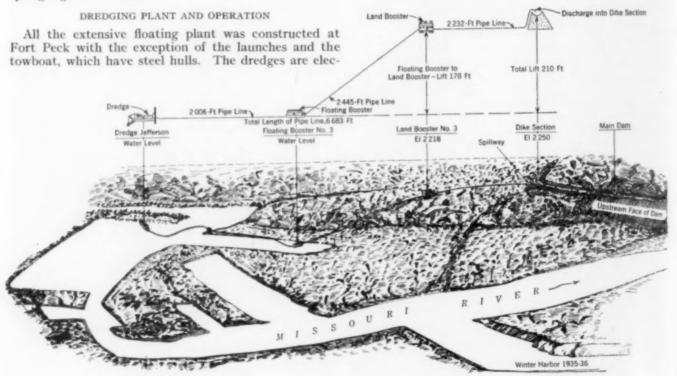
Sketch of Dredging Plant Arrangement, as Utilized for Building the Dike Section
